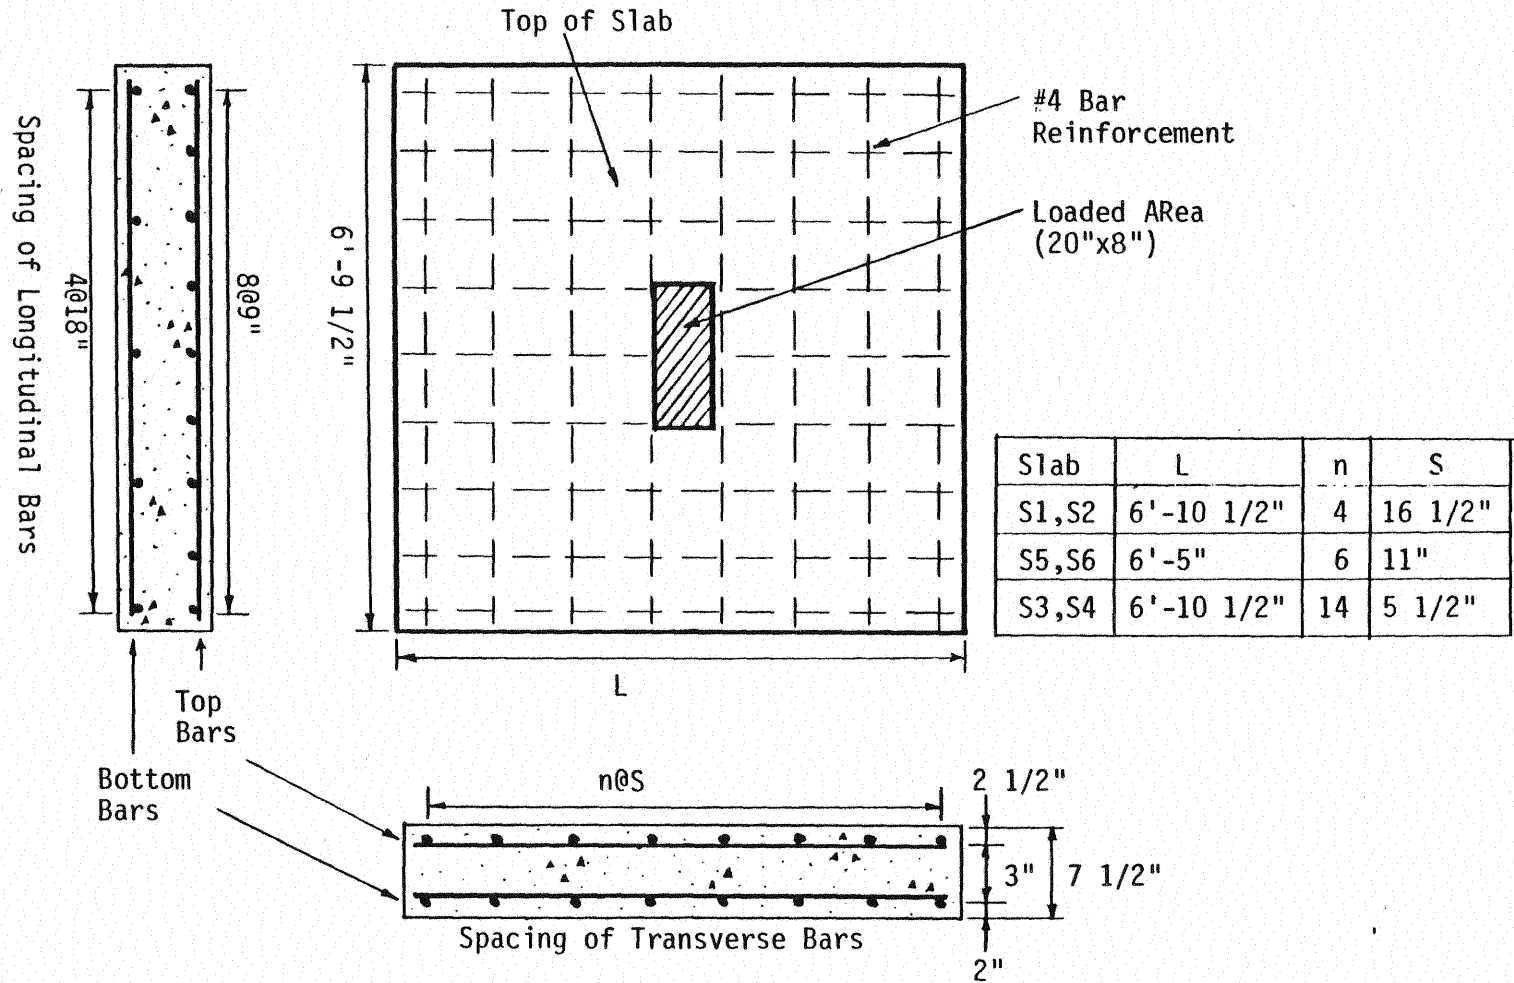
Control Slab Specimen Details for Transverse Slab Strength Tests
